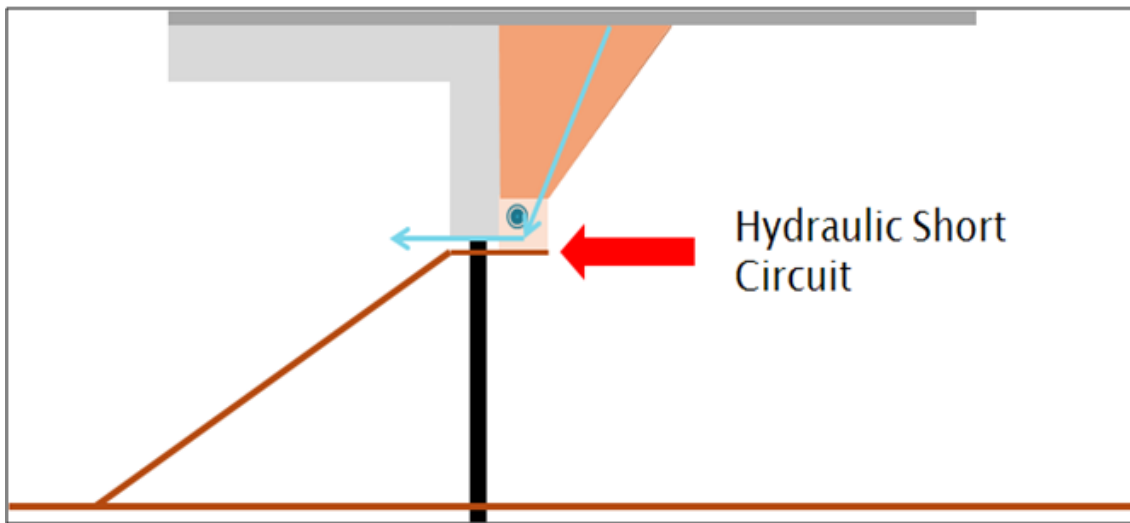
Schematic Cross-Section View of Hydraulic Short Circuit that Can Develop in the Abutment Drainage System (from Miller et al. 2013)
